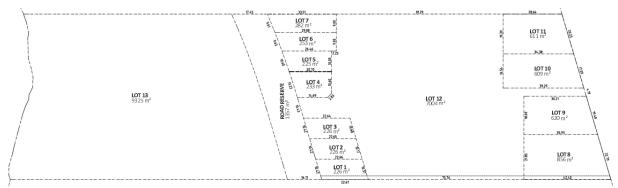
An extract of the lot layout plan, showing the locations and sizes of proposed allotments.
